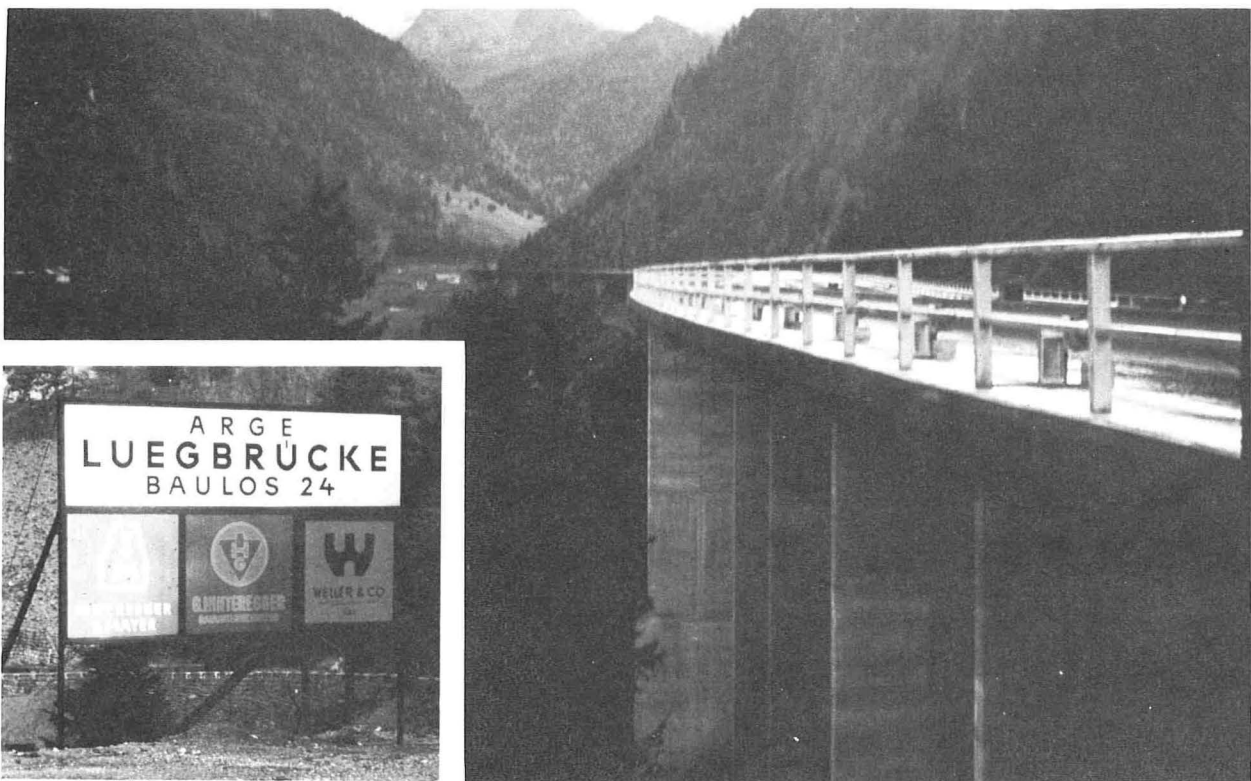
Luegbrücke on Brenner Pass Autobahn utilizes 5700 ft. long hybrid concrete box and steel girder design.
